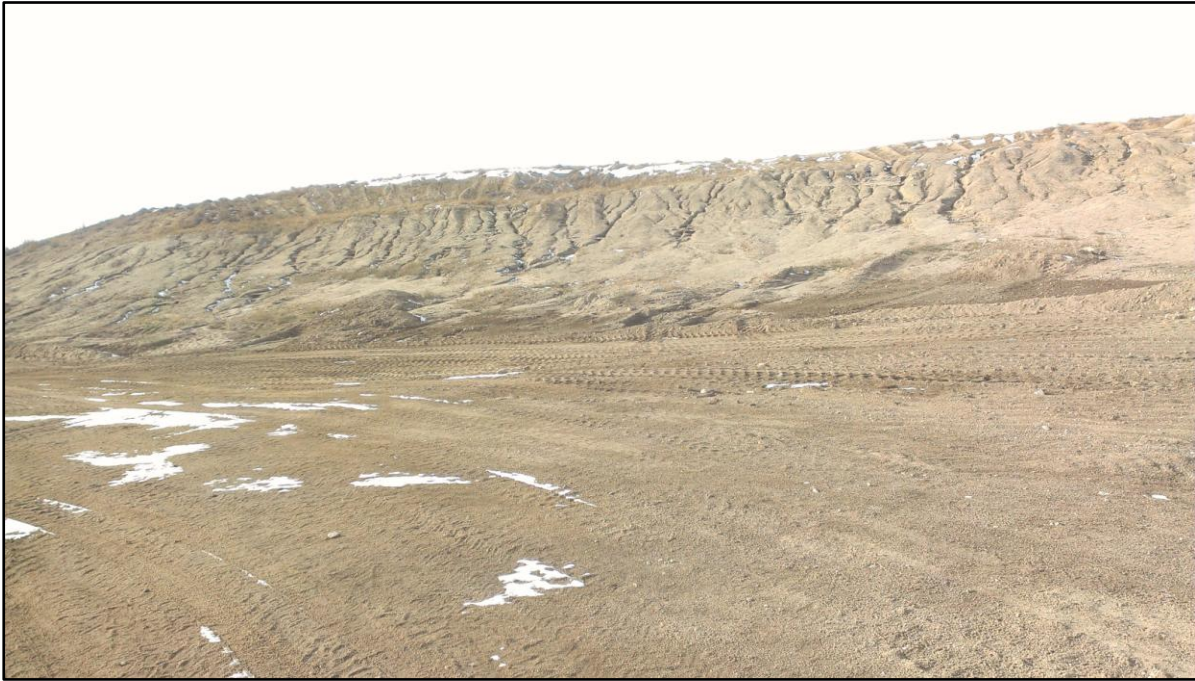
View looking northwest from pit floor, showing some rilling that has developed along the northwestern mined wall.
